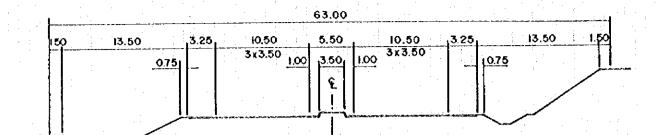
Typical Cross Section for Toll Road (Type I/Class I)
